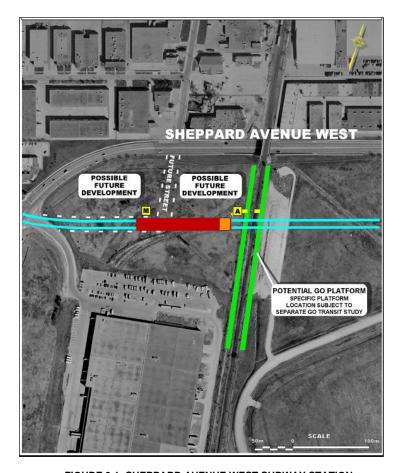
SHEPPARD AVENUE WEST SUBWAY STATION
